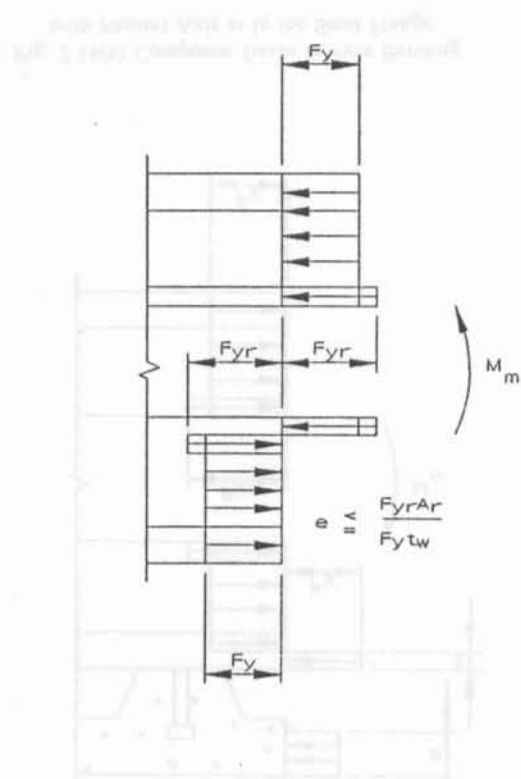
(b) Reinforced Steel Beam in Pure Bending with Neutral Axis in Reinforcement
